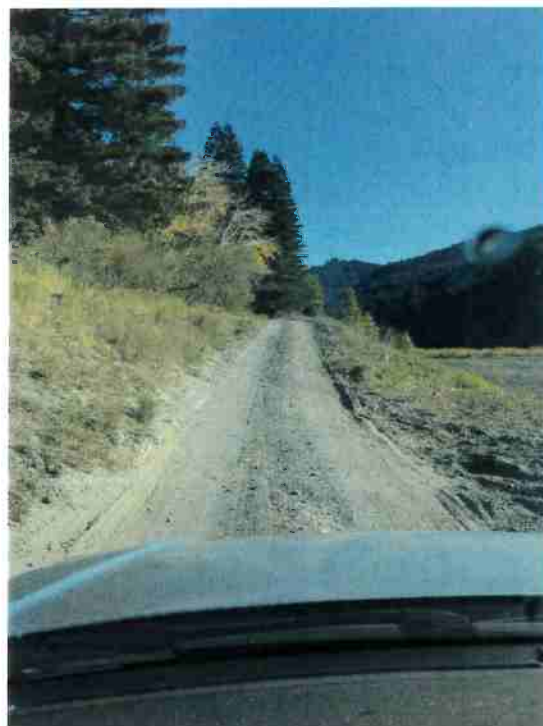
11'-wide, one-lane, low water bridge and approach, no shoulder, gravel surface.
